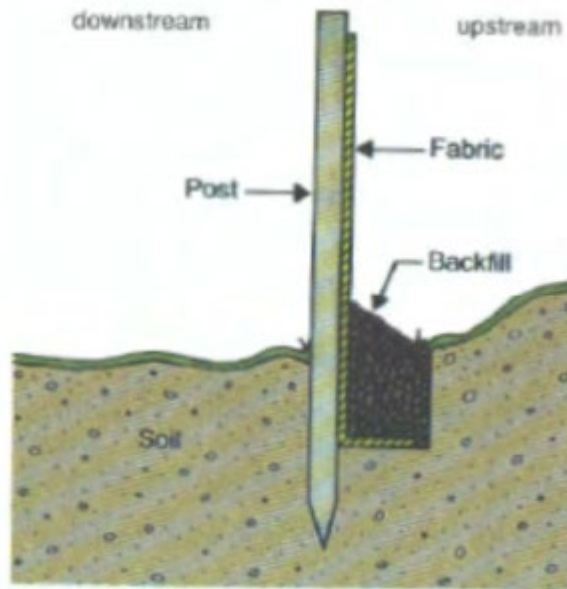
Silt Fence Installation (Gosse et al. 1998; DFO, 2022)
